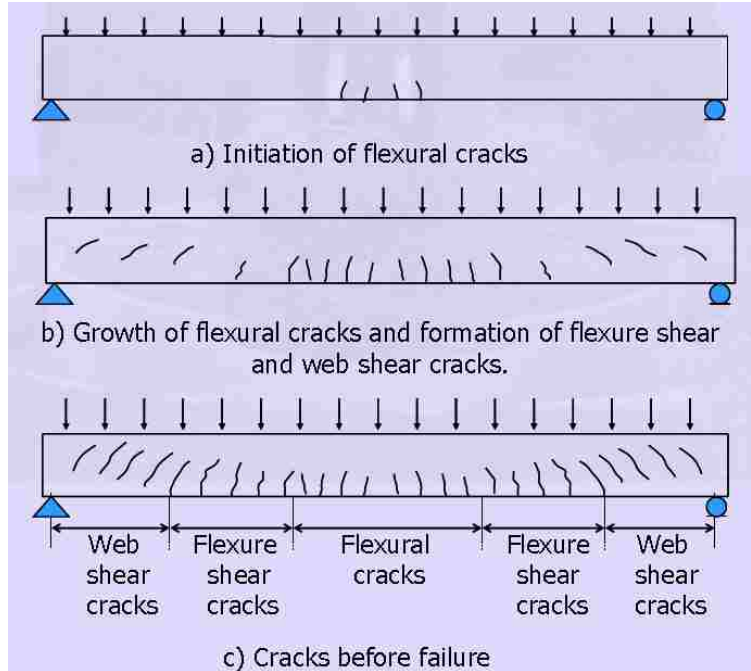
Formation of cracks in a simply supported reinforced concrete beam
